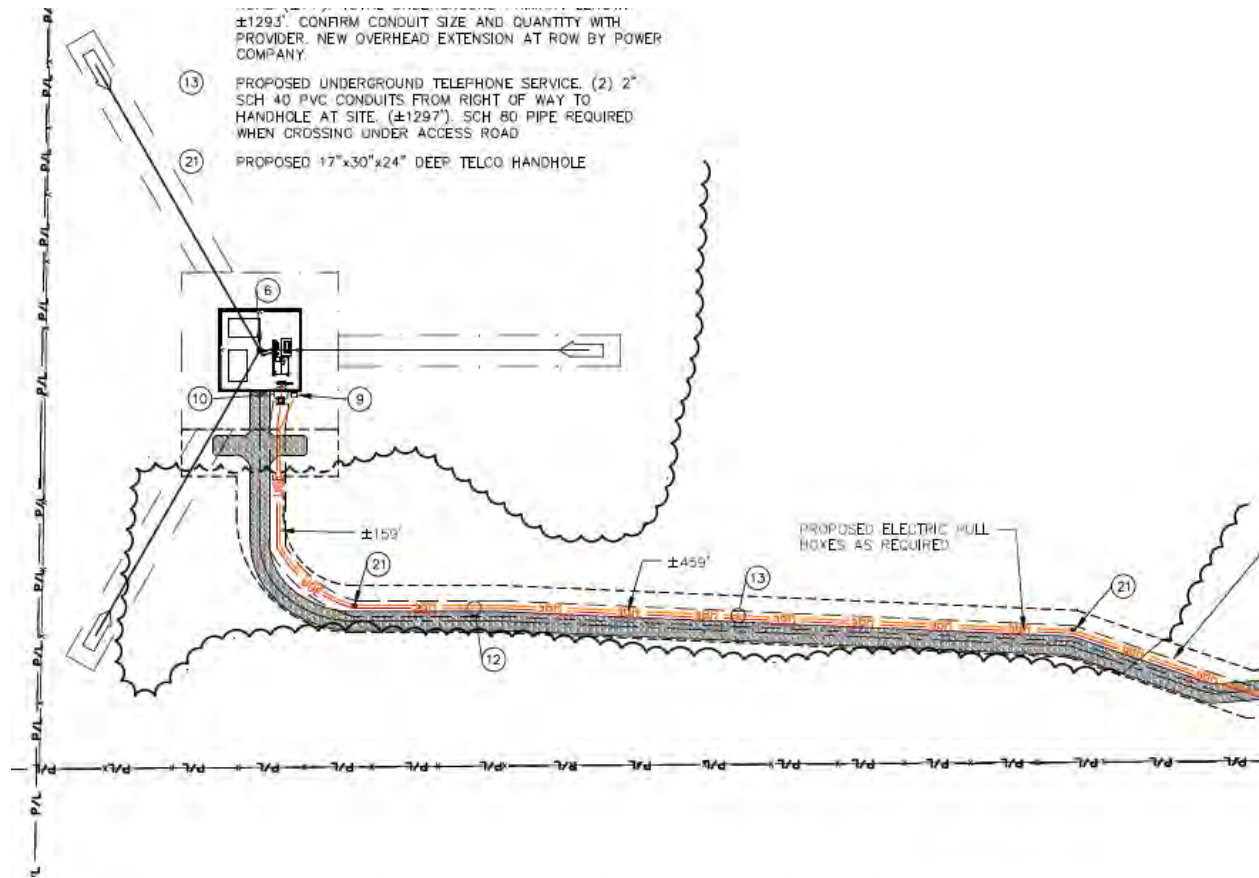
Site Plan with Power and Fiber Utilities continued
